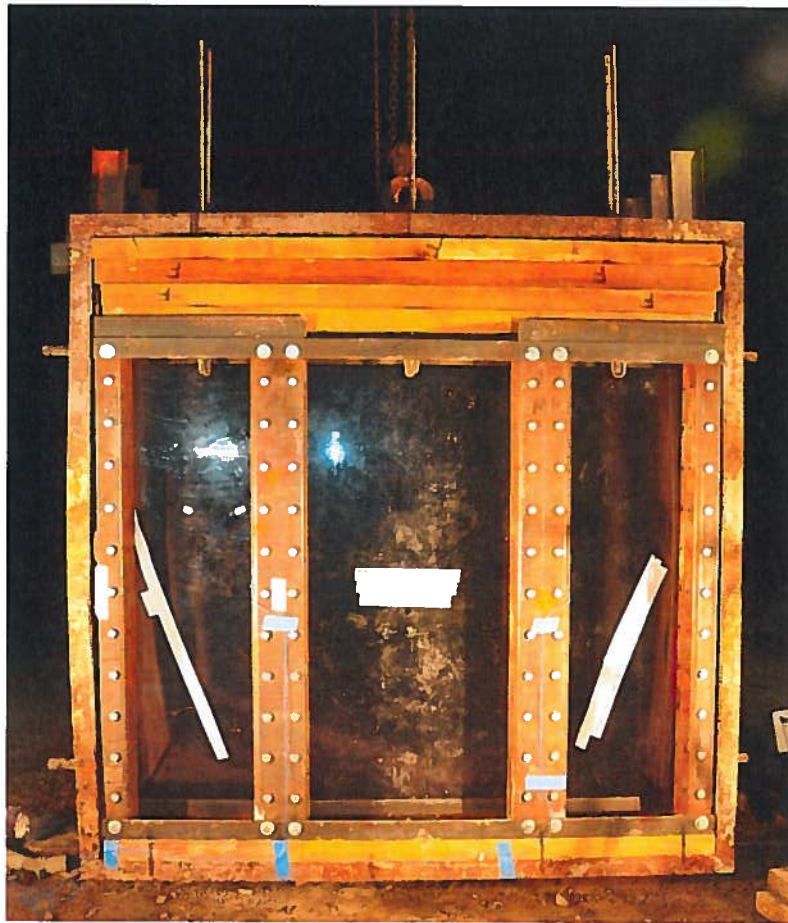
Constructed Smaller Polycarbonate Wall System for Additional Testing
